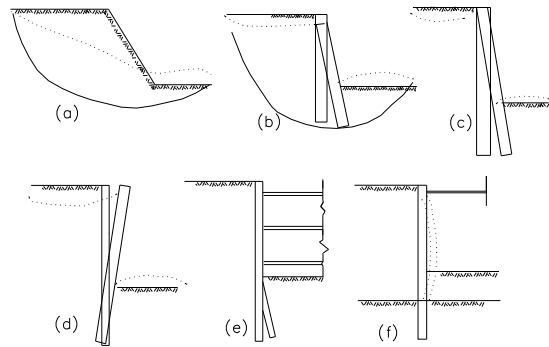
Deformation and failure modes of soft soil deep excavations
